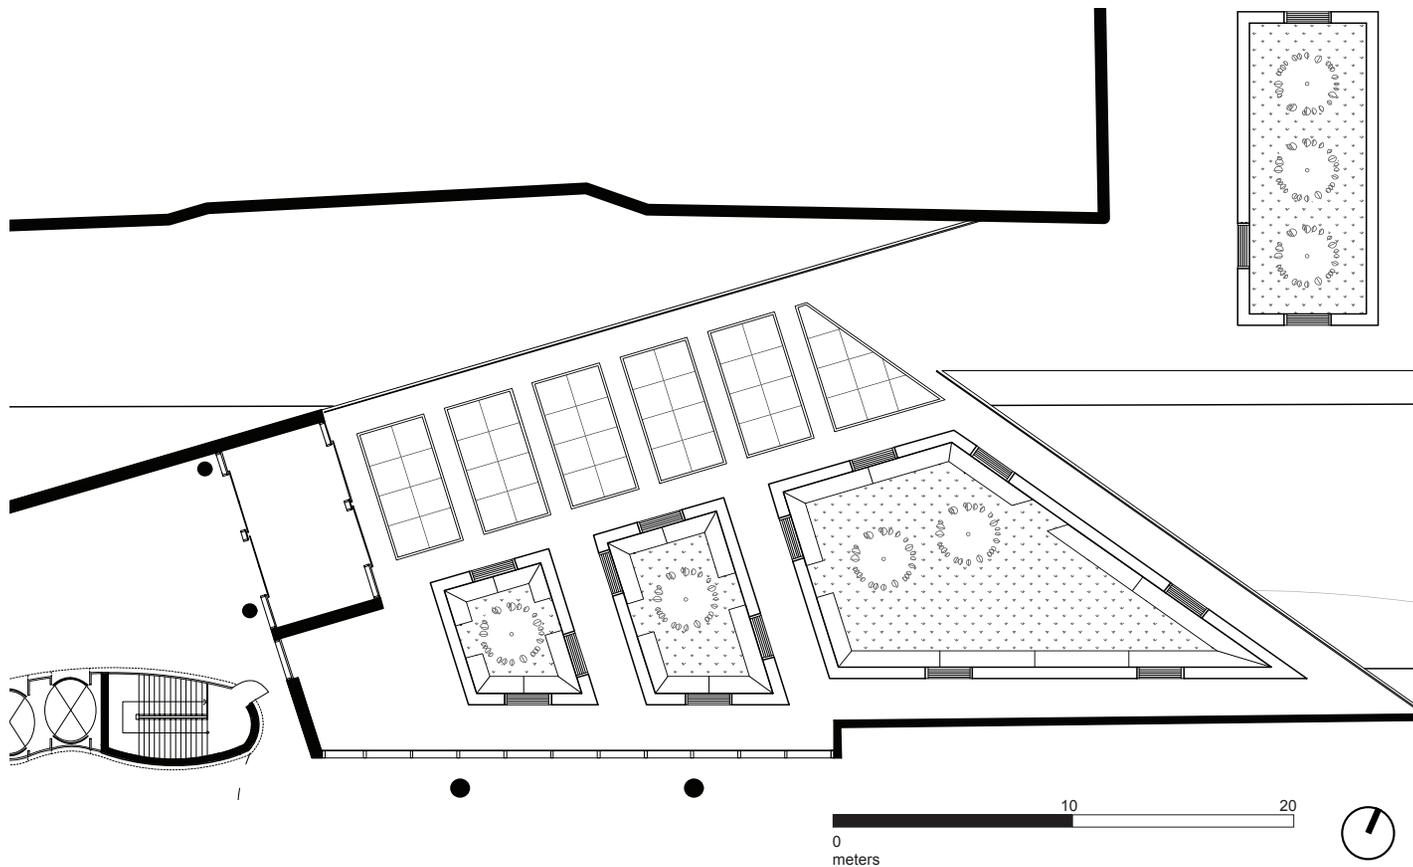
Exterior terrace floor plan - over Station Street on the main level of the station.
